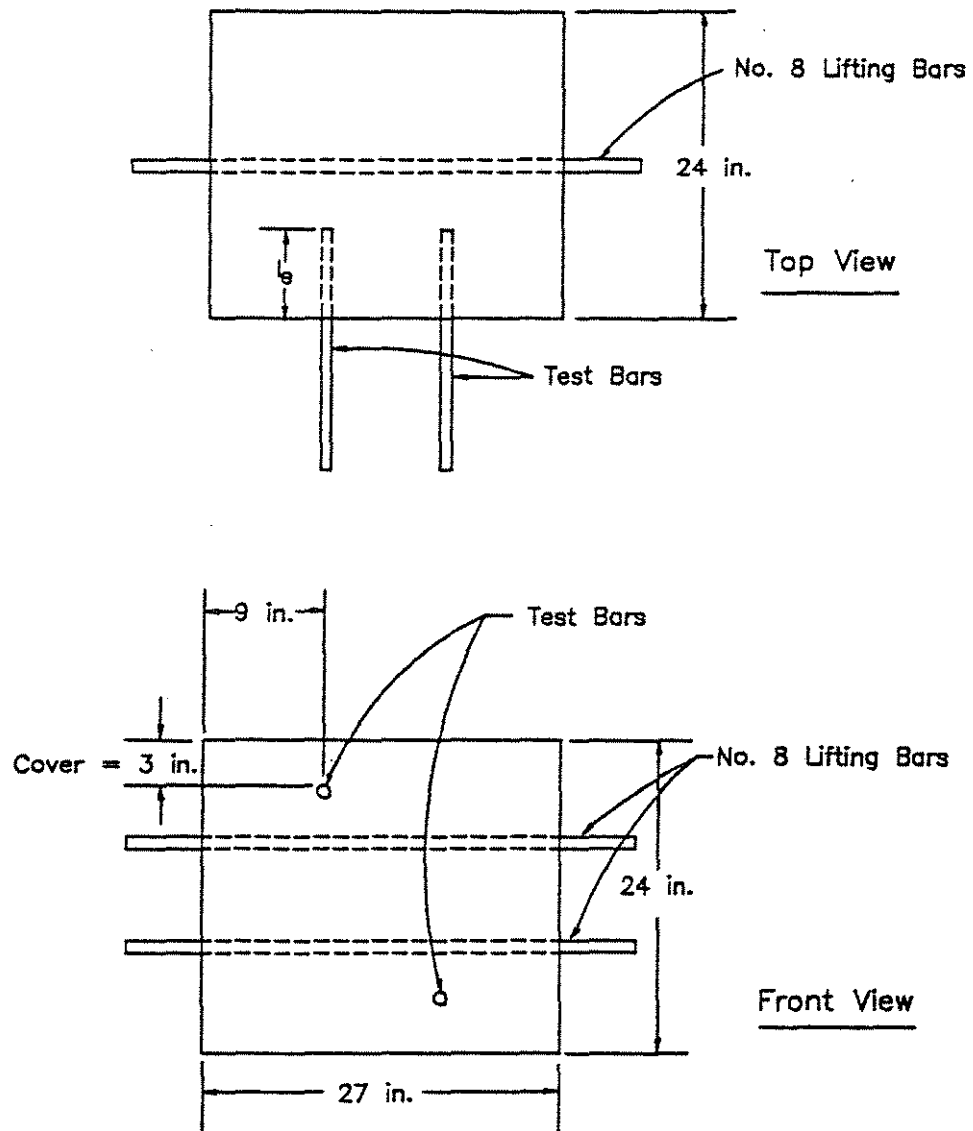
Typical Test Specimen with Horizontal Bar Installation
